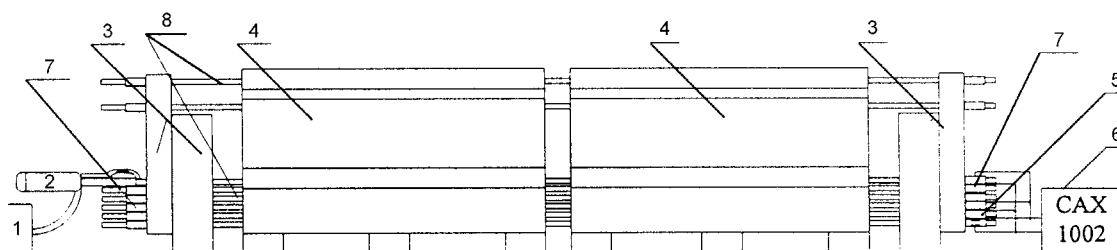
Example of prestressing line. 1-hydraulic drive-control unit, 2-tensioning and conveying device, 3-pressure block, 4- girder modules, 5-tensometric sensors, 6-tensometric bridge, 7-anchoring clamps, 8-strings.
